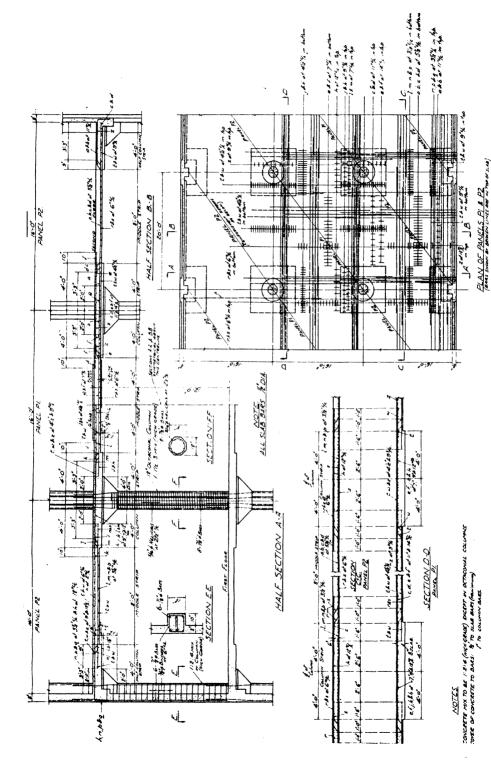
Details of Flat-Slab Construction. (Code.)
